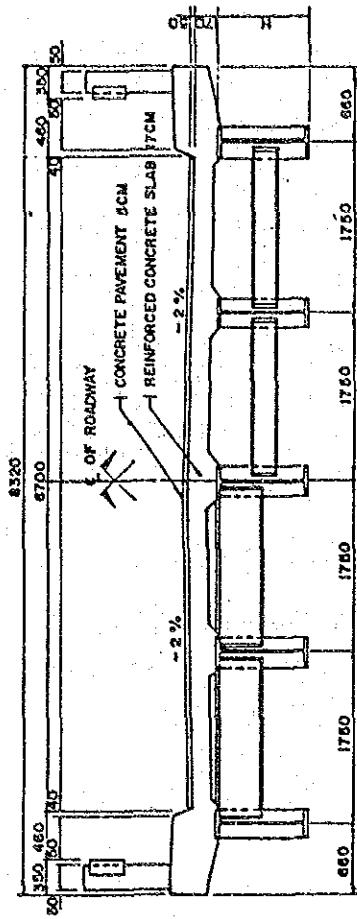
TYPICAL GENERAL VIEW OF BRIDGE
